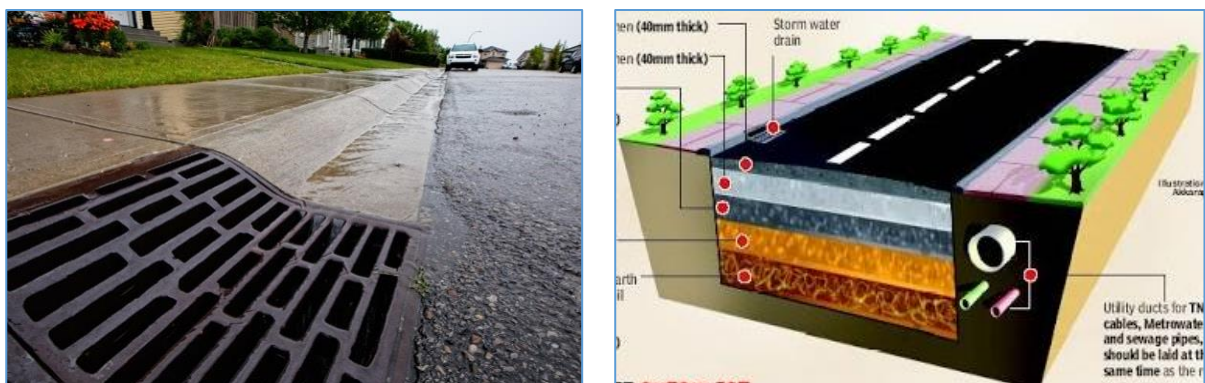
Typical Conceptual Plan of Road Side Drainage
